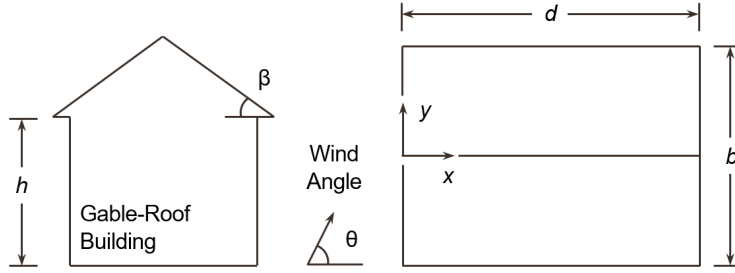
Building geometry definitions on a regular gable-roof building model shown in elevation and plan view.
